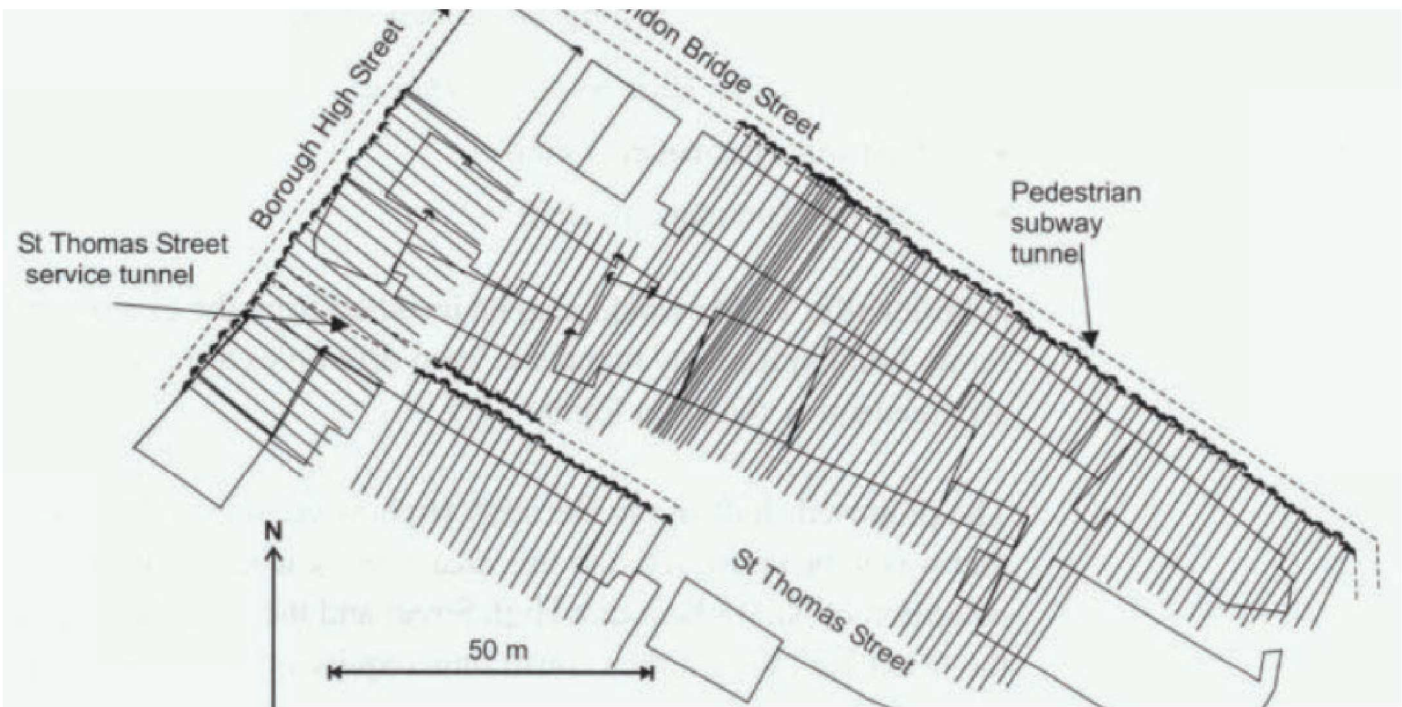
Plan of space with TAM locations in relation to the proposed site
